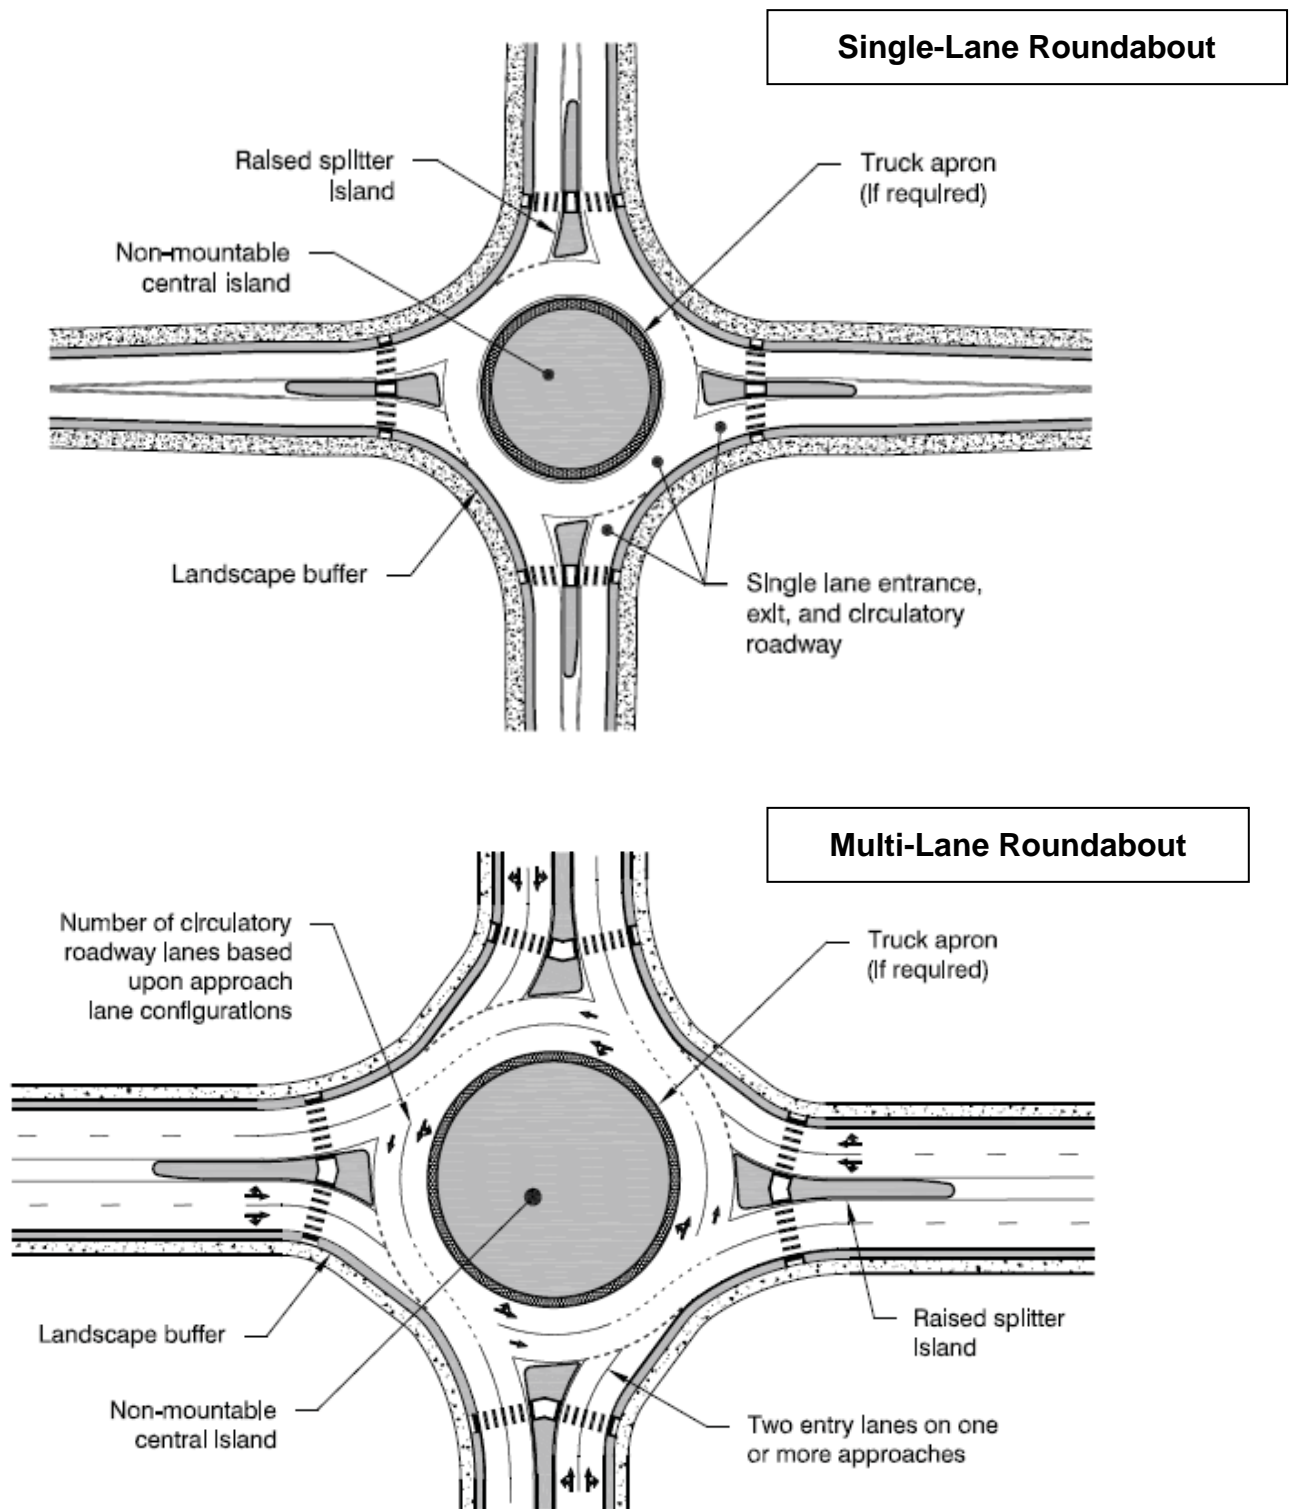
Typical Layouts for Urban and Rural Intersections
